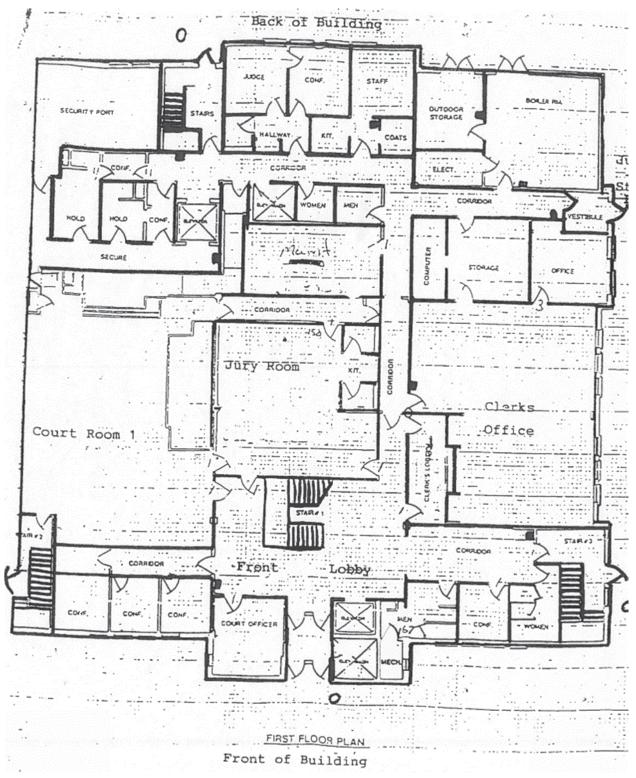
Building Floor Plan provided by BGS (N.T.S.).
